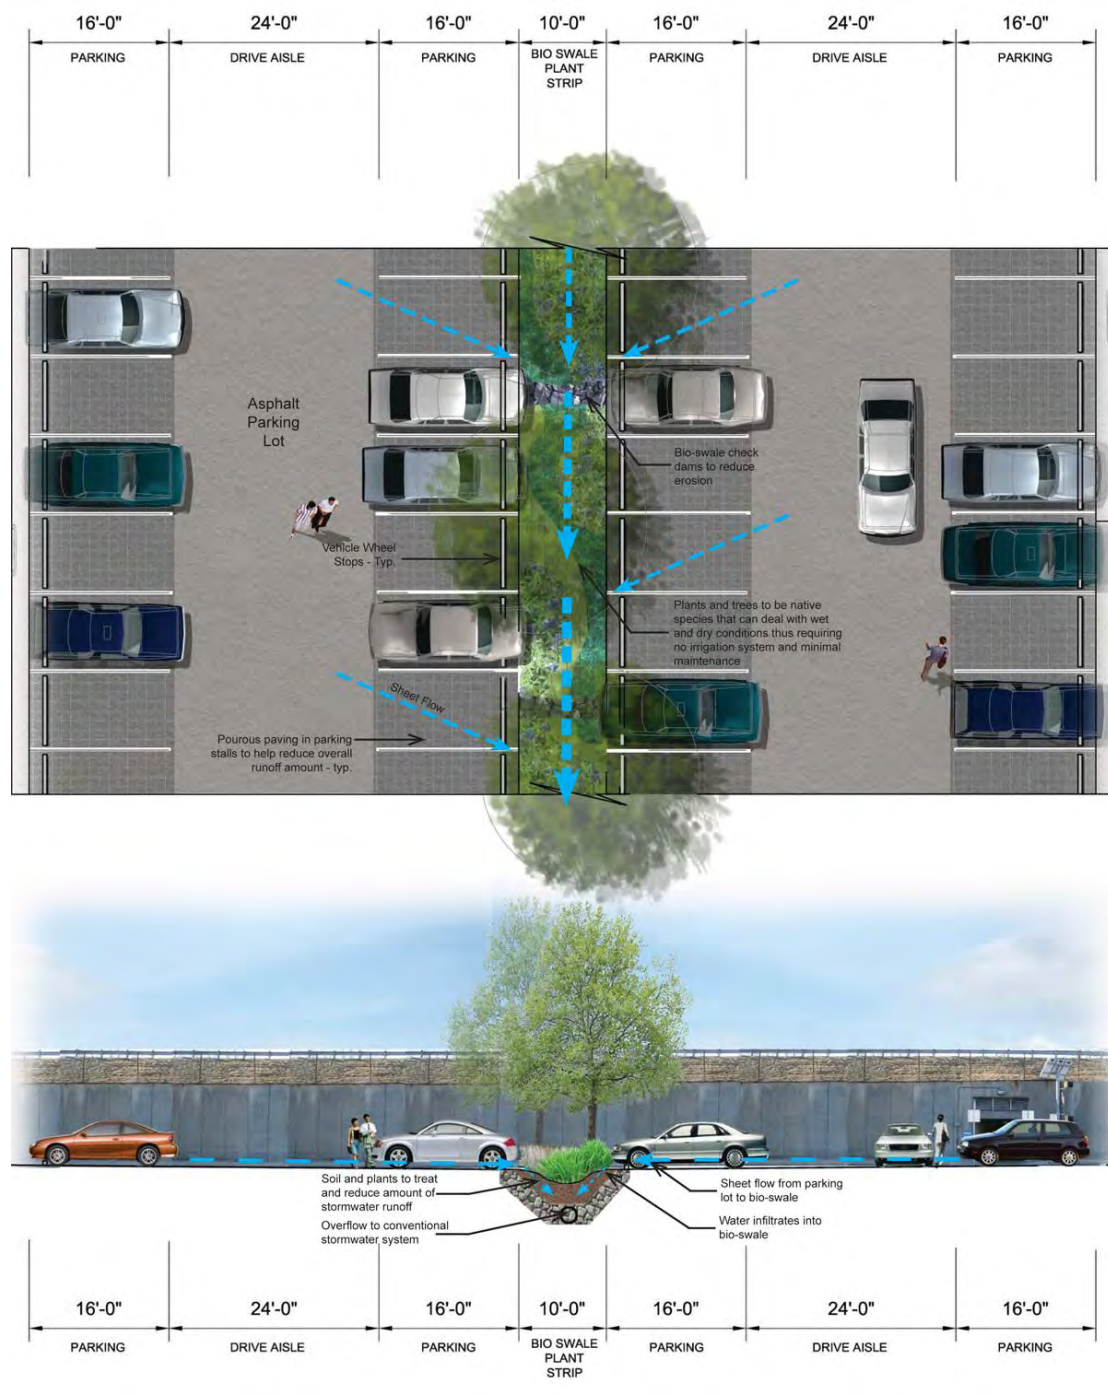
Typical Bio-Swale Planting Strip at Parking Area.
